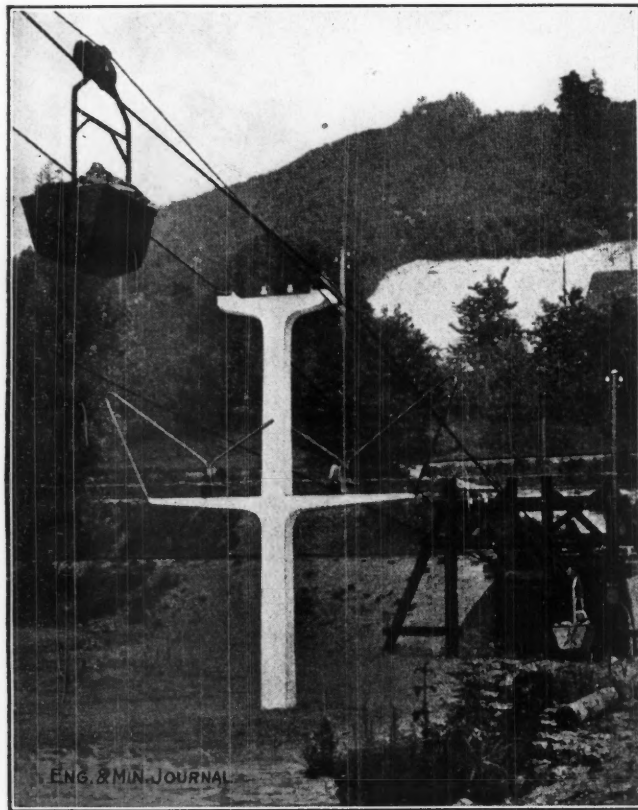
CONCRETE ROPEWAY SUPPORTS AT EUROPEAN CEMENT PLANT
